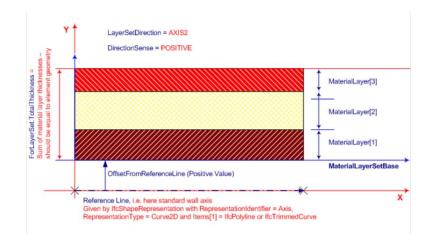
Wall Material Layers (BuildingSMART, 2022)
